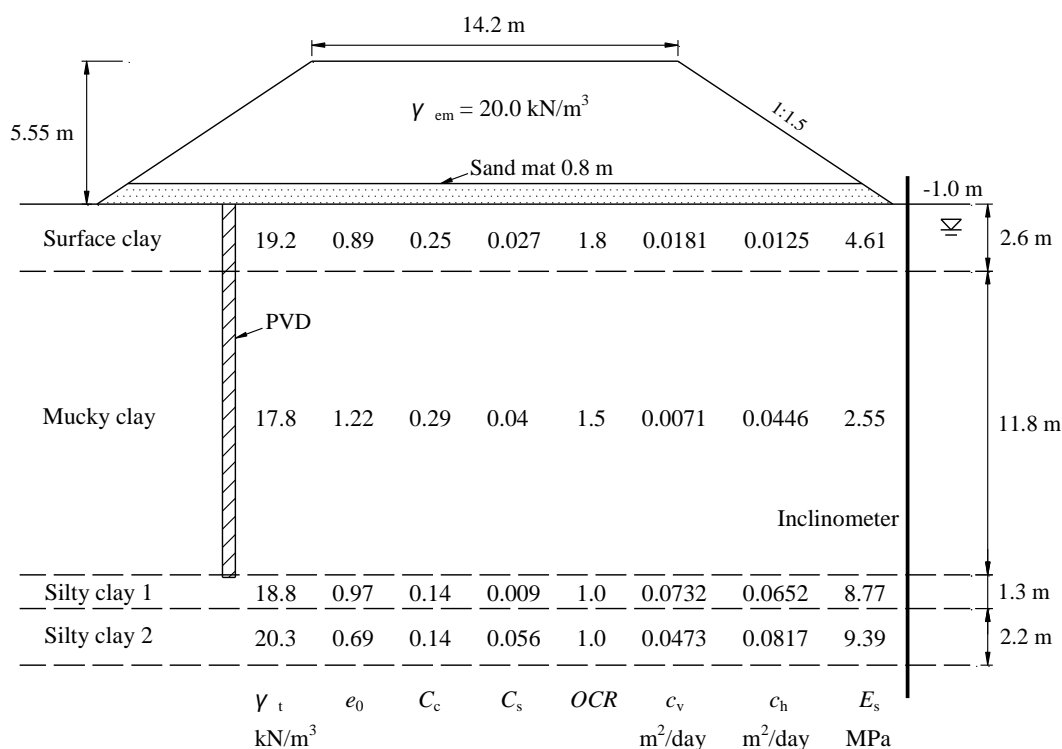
Cross-section and soil profile of embankment at Kunshan
